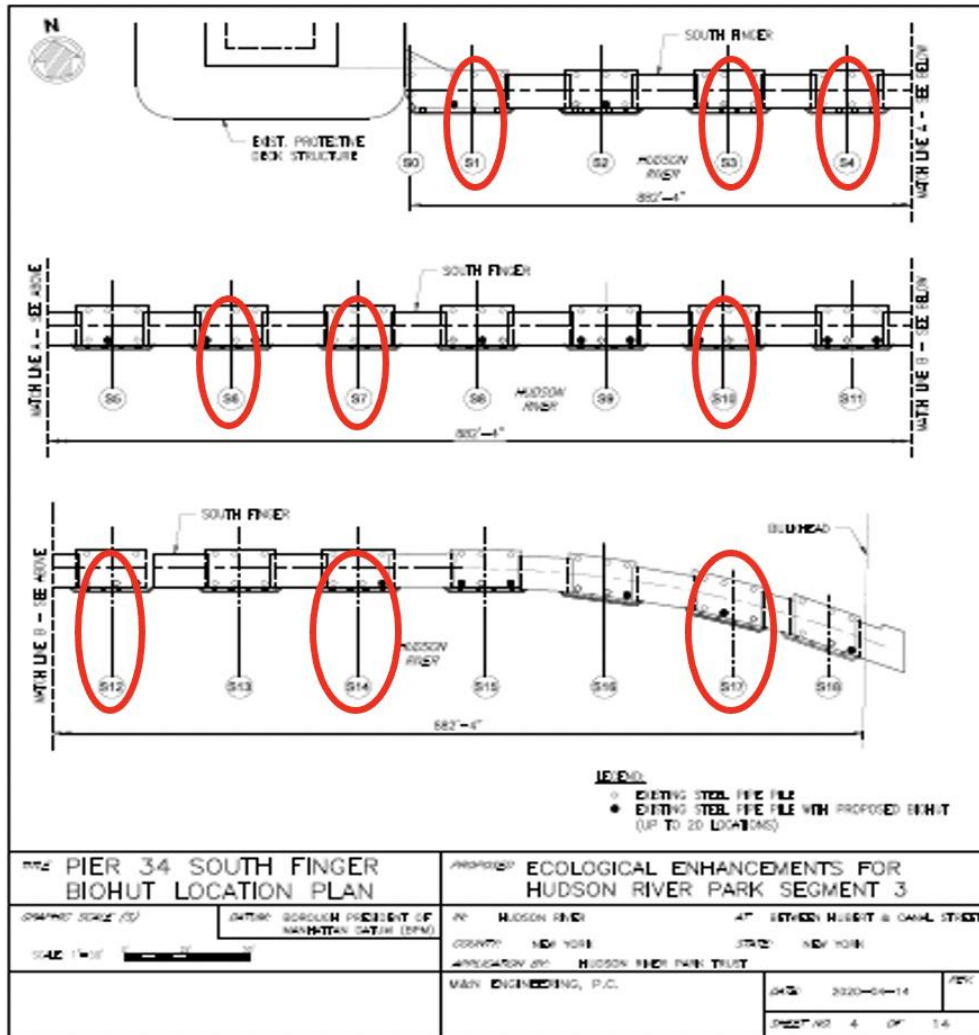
Plans for Pier 34 pilings. The encircled pilings clusters were chosen for surveys, with random pilings within each cluster picked.
